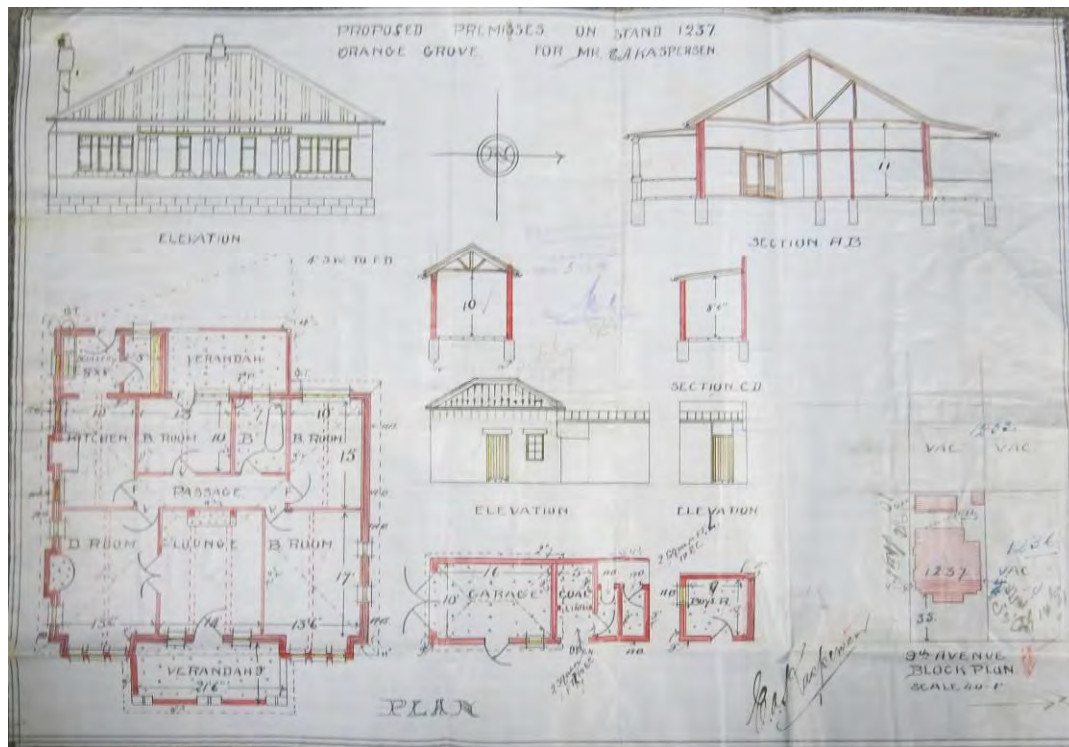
Plan for proposed three bedroomed house on the corner of Ninth Avenue and Tenth Street
